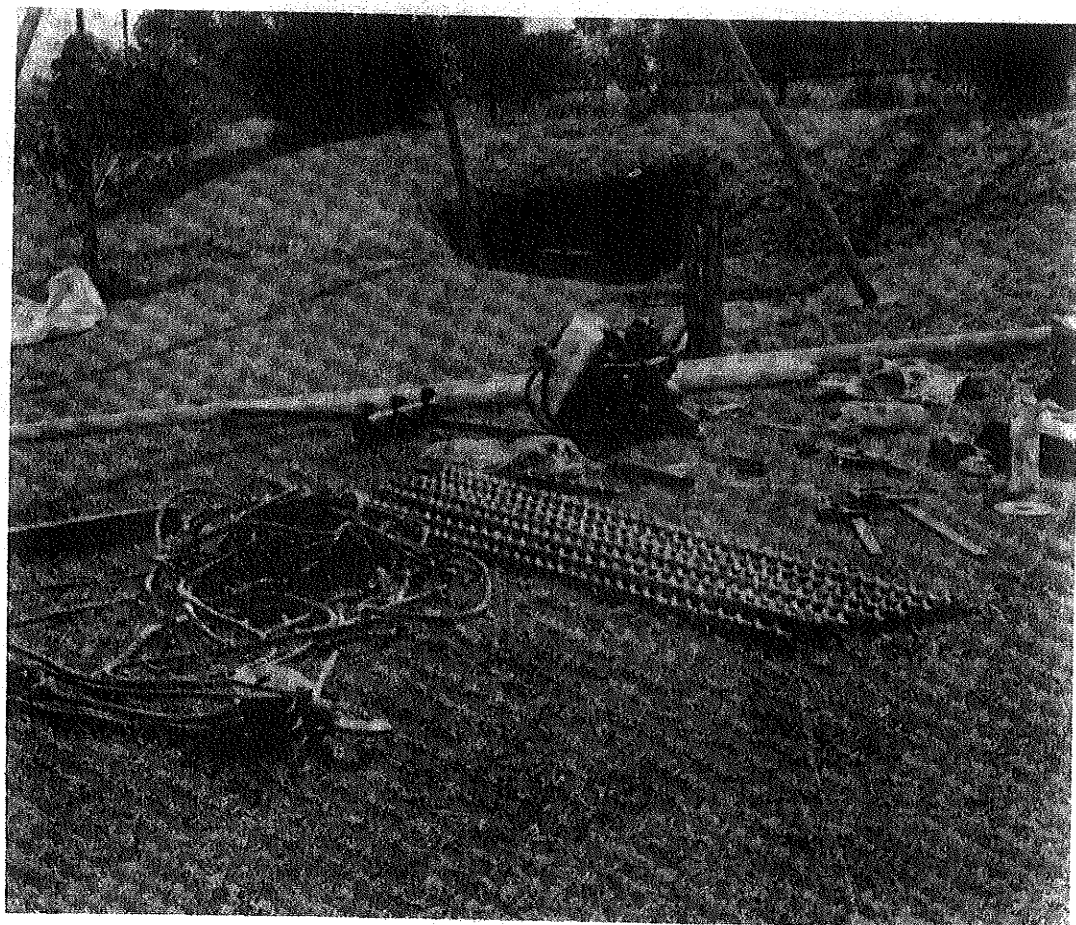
DRILLING EQUIPMENT AT FIELD SITE
